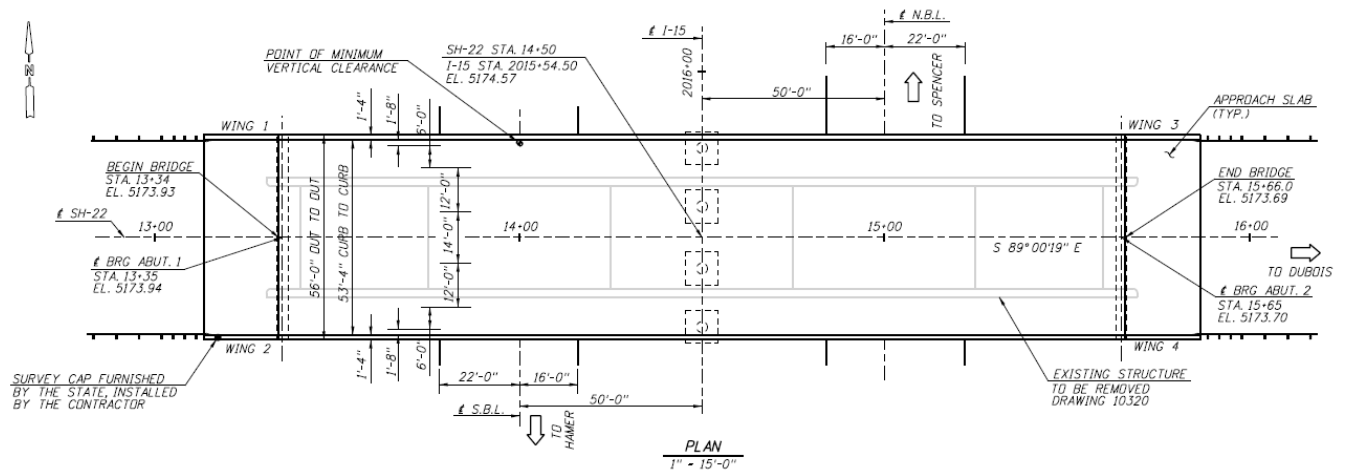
Plan View of the SH-22 over I-15 Bridge at Dubois (NTS)
